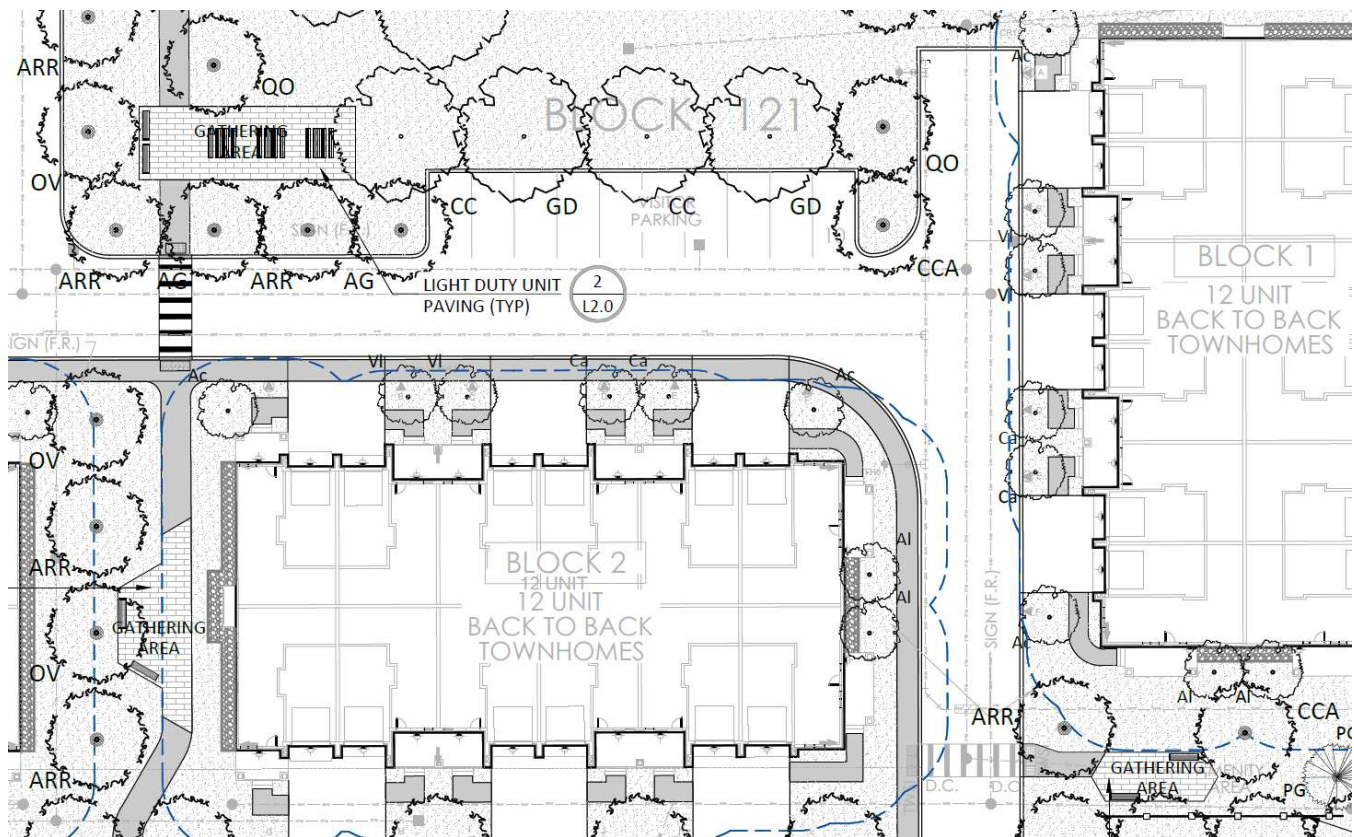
Excerpt from proposed landscape plan showing three well-treed gathering areas
